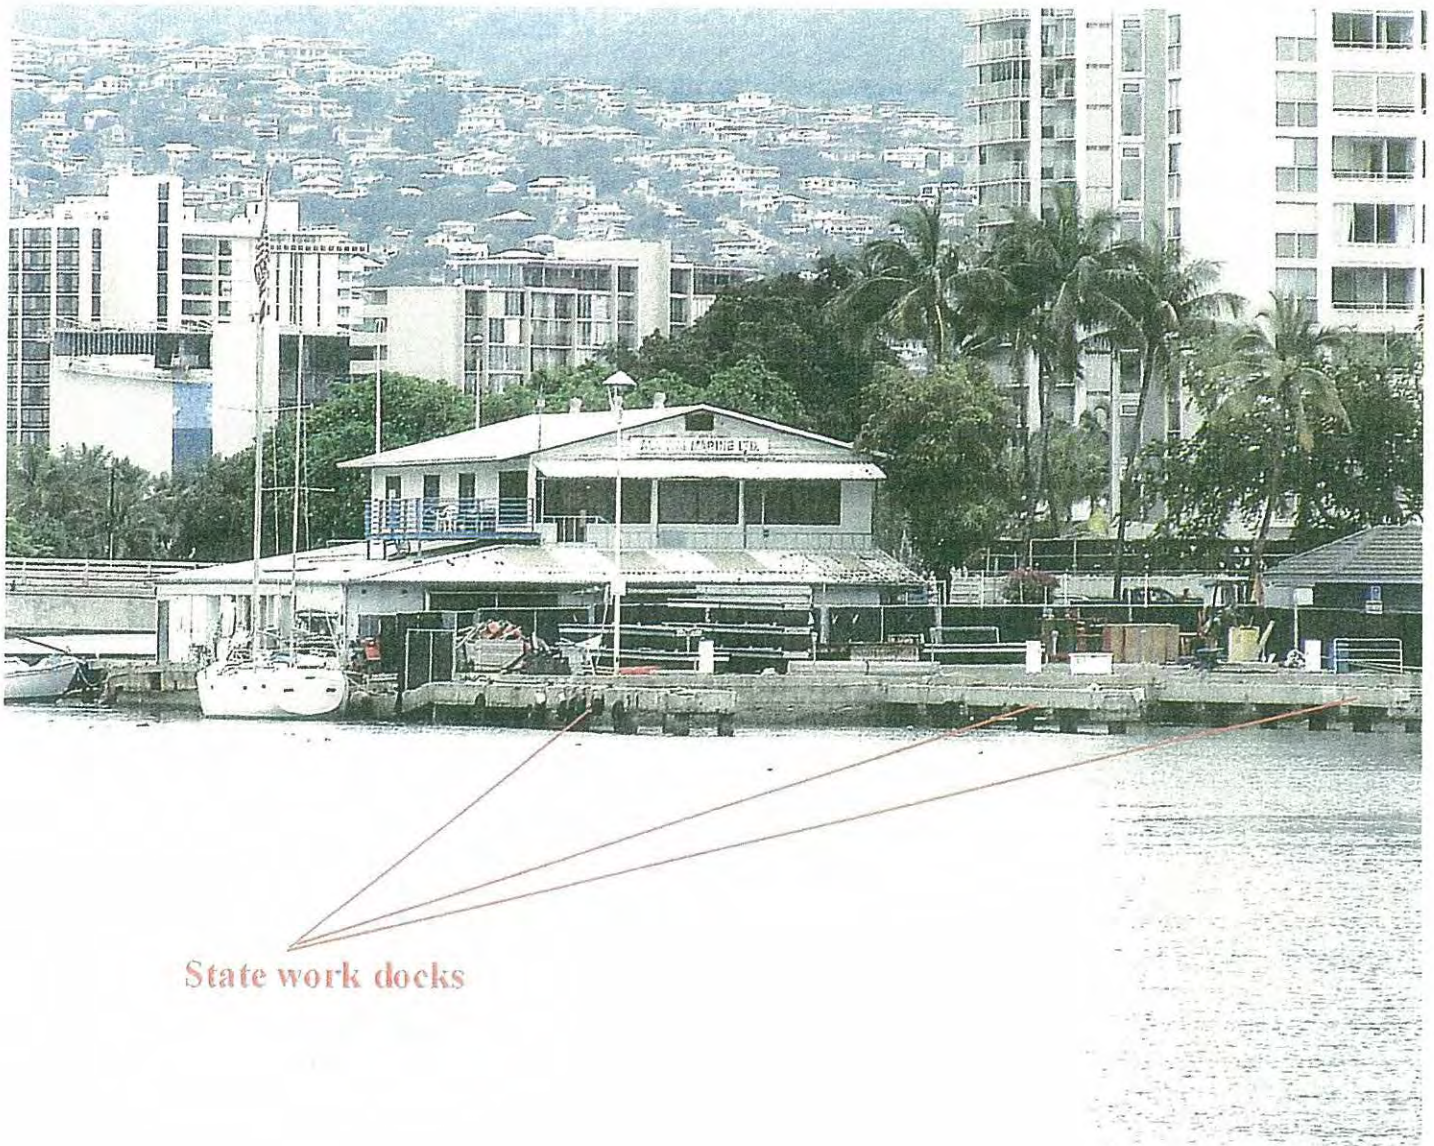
K - Ewa side of Boatyard Repair Site. Looking Makai.
